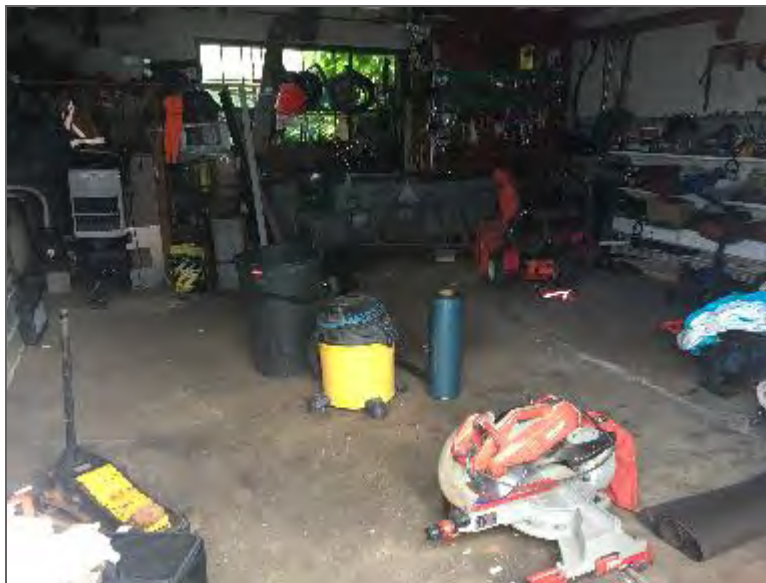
General view of minor black staining observed within the detached garage building associated with Site Building B (PCA).
